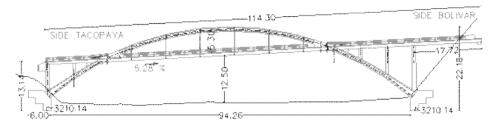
Longitudinal view of the Vaqueria Bridge.
